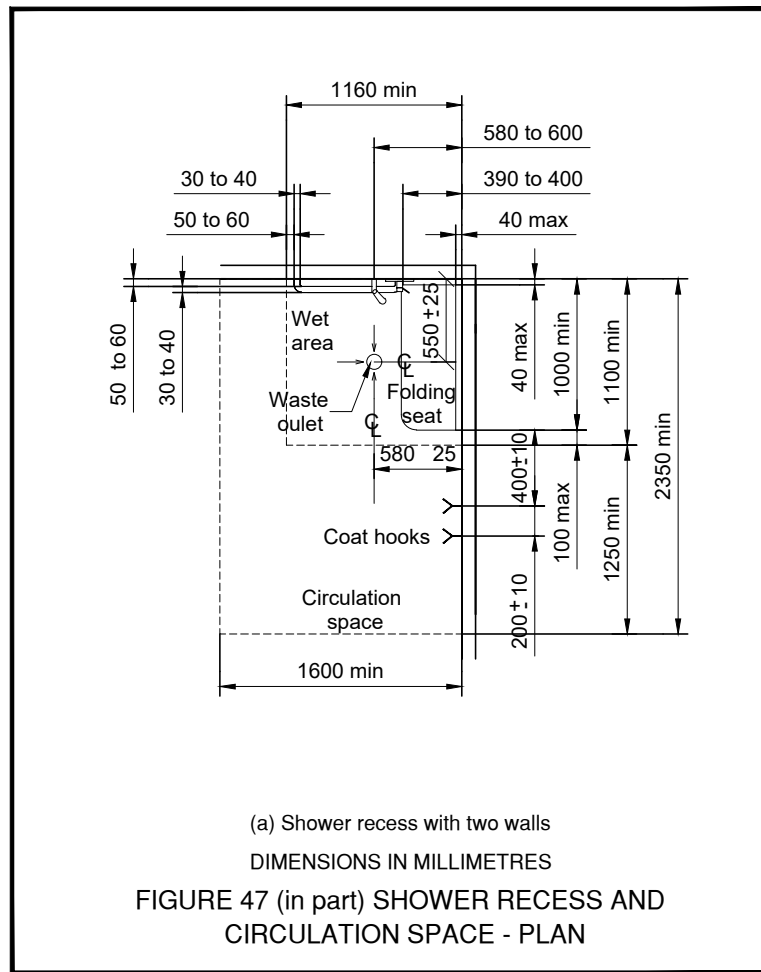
(in part) SHOWER RECESS AND CIRCULATION SPACE - PLAN
